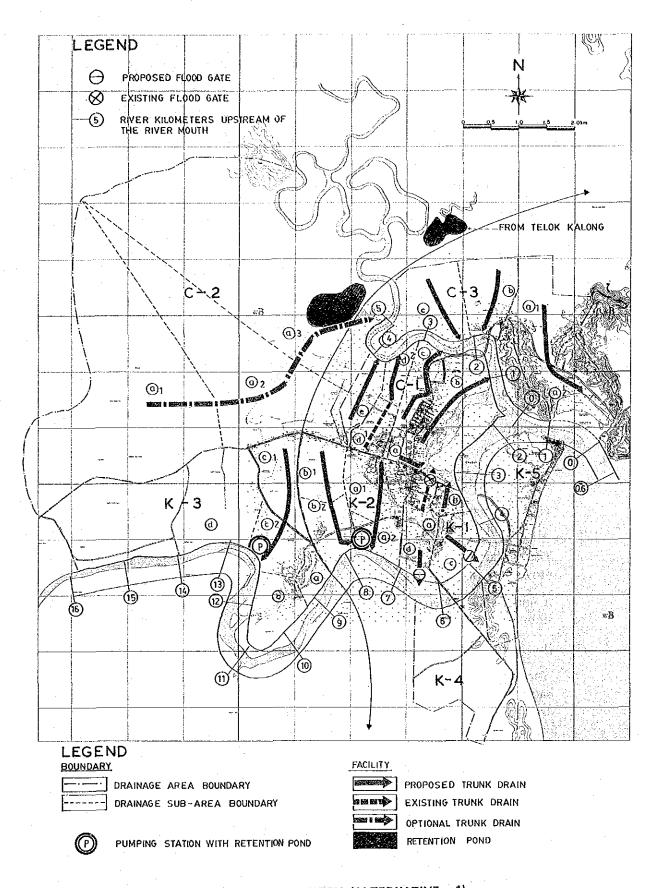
DRAINAGE SYSTEM (ALTERNATIVE - 1)
